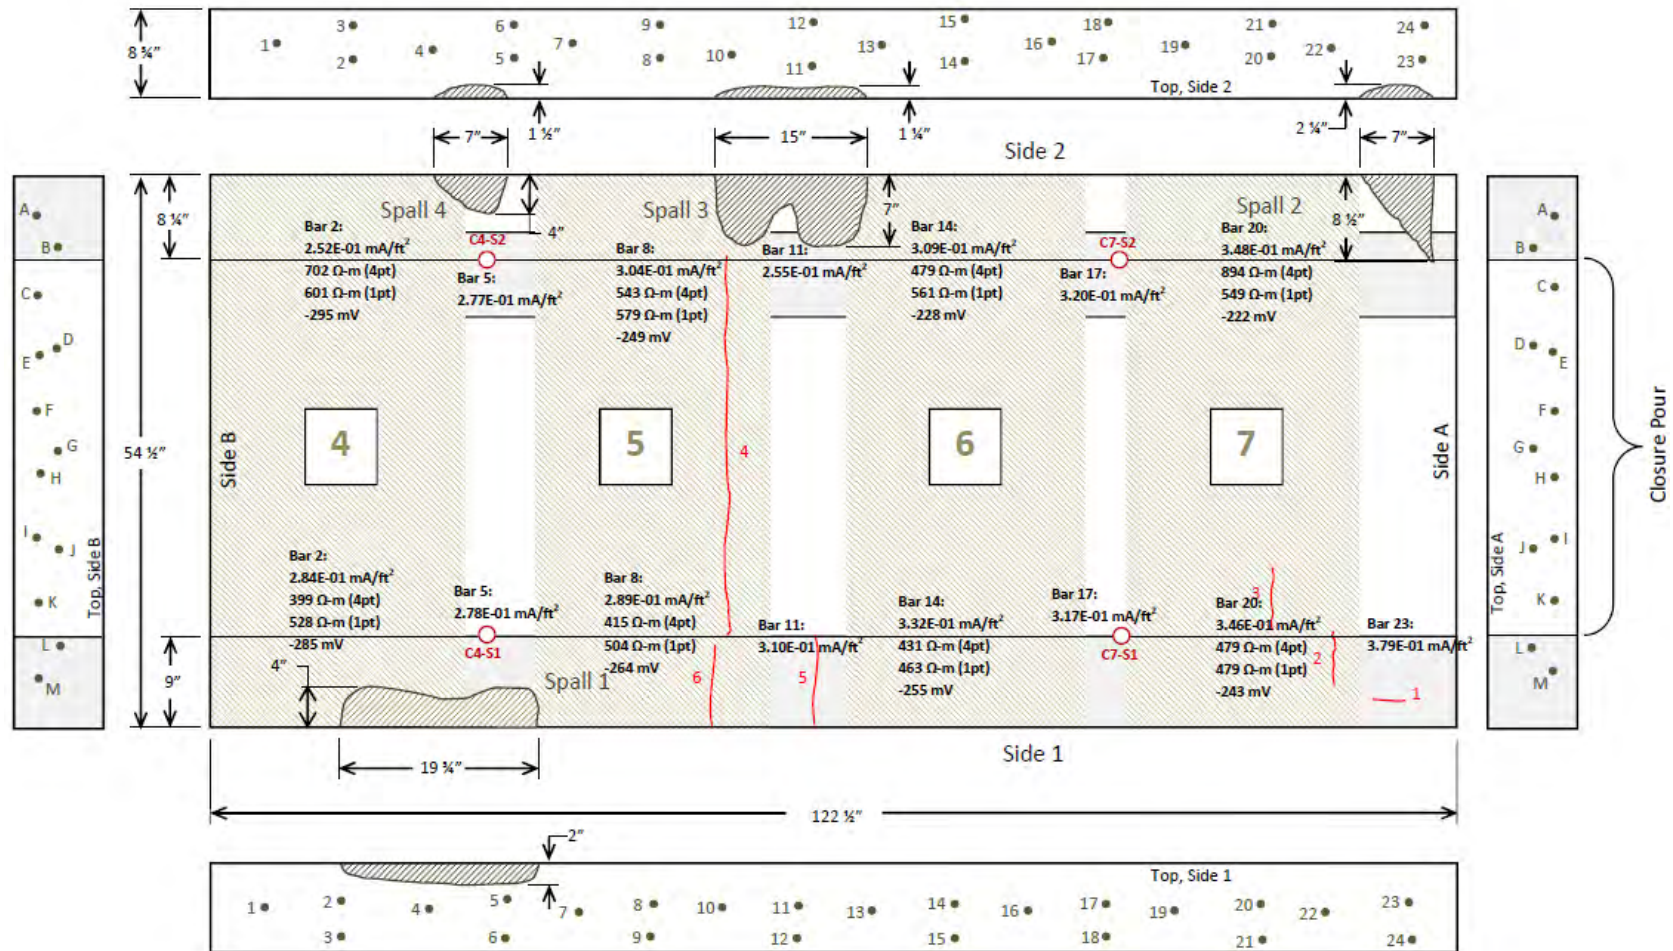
Crack, Damage Survey, and Rebar Locations for Slab 3
